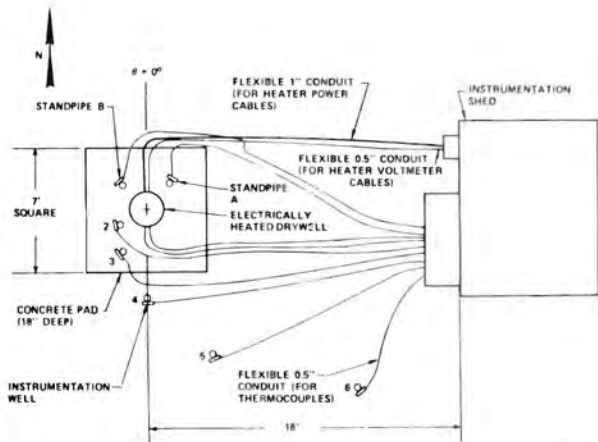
Electrically Heated Drywell Instrumentation and Power Cable Routing Arrangement
